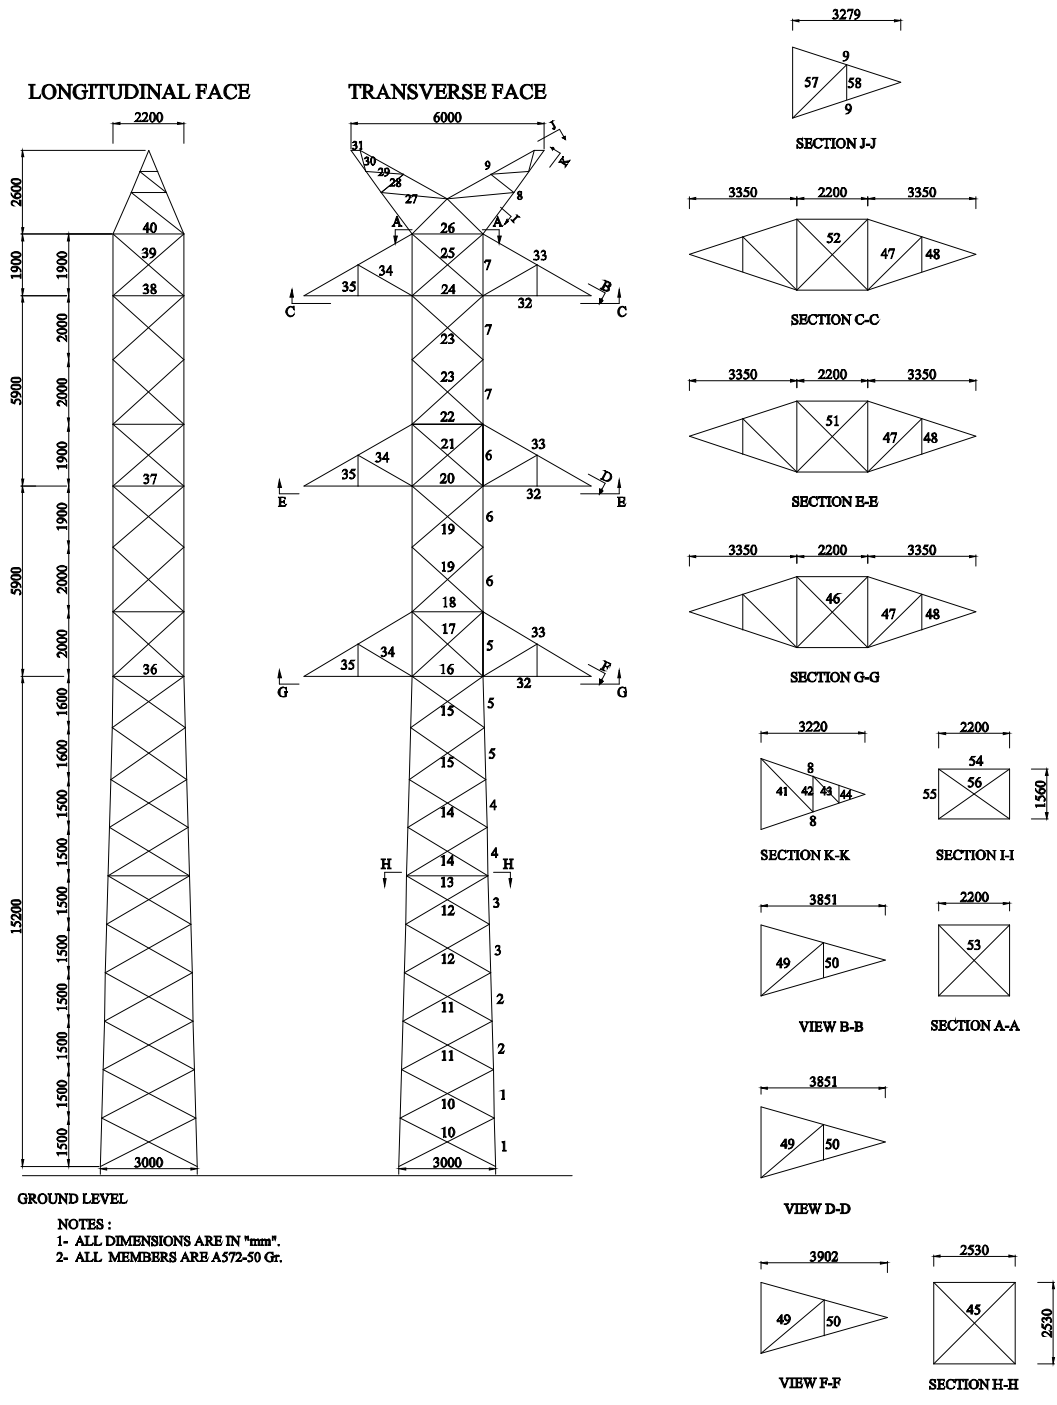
The 397-member, 220kV suspension tower (all units are in mm).
